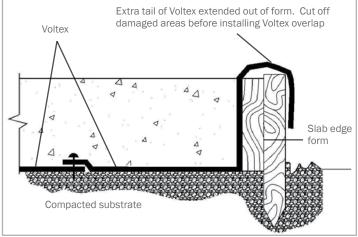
Extra tail of Voltex extended out of form and later cut off after concrete pour.
